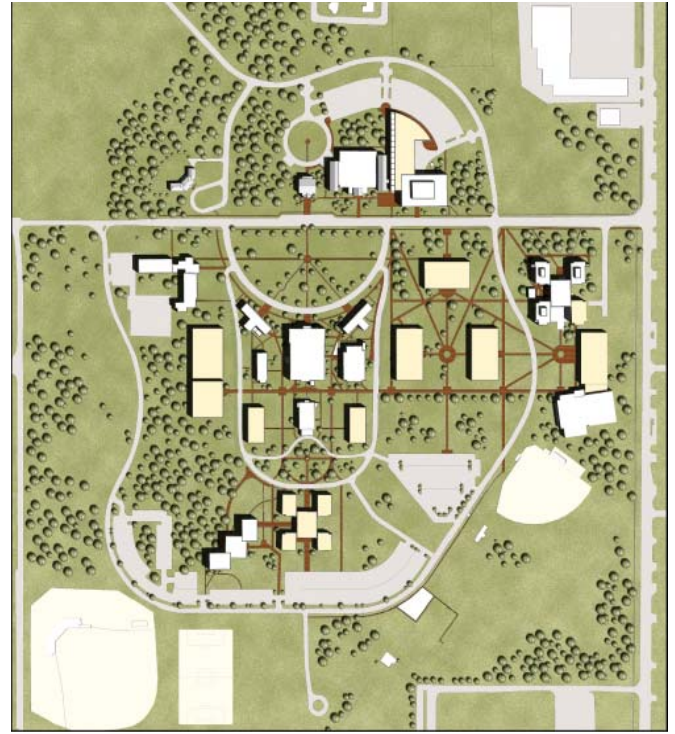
"Beyond 2007", 1998 Campus Master Plan (includes proposed future developments beyond the 10-year scope of the 1997 Campus Master Plan)
